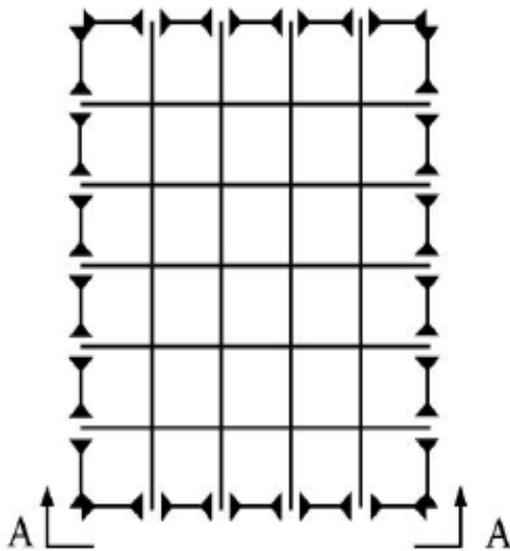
Plan of Twenty storey benchmark building, (Y.Ohtori et al., 2004)
